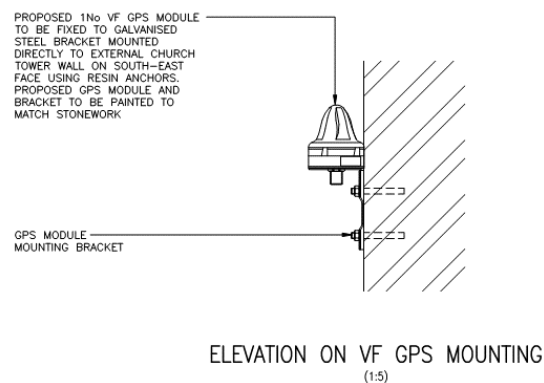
Location of 1 No.GPS Module and side elevation.
